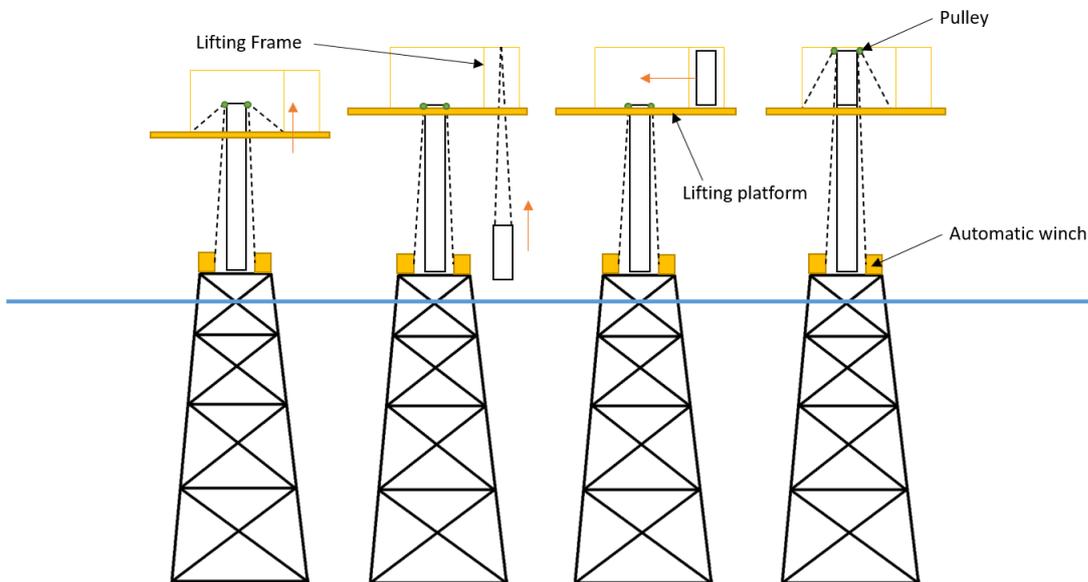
Sketch of workings generated concept 5, elevator platform.
